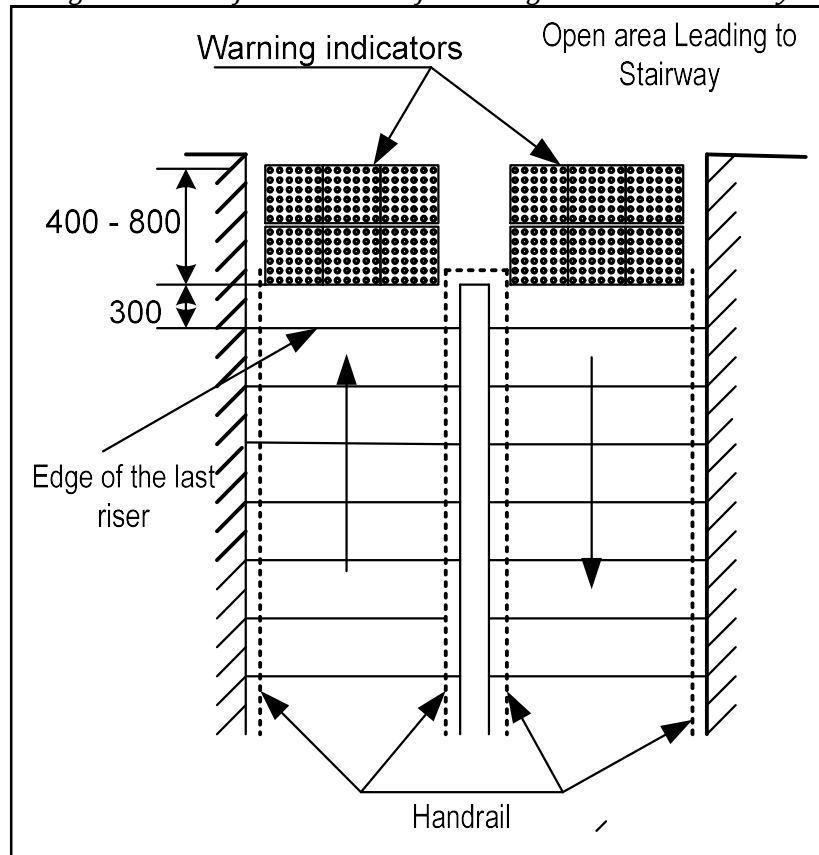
Plan of installation of warning TGSIs at open area leading to stairway
